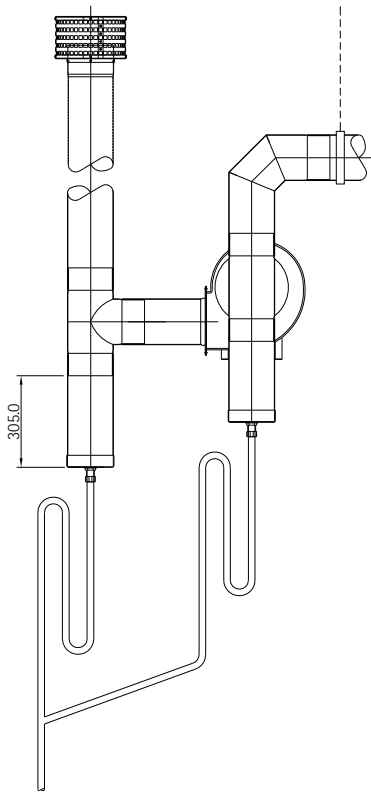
Type 'O' Fan Outlet Dimensions
